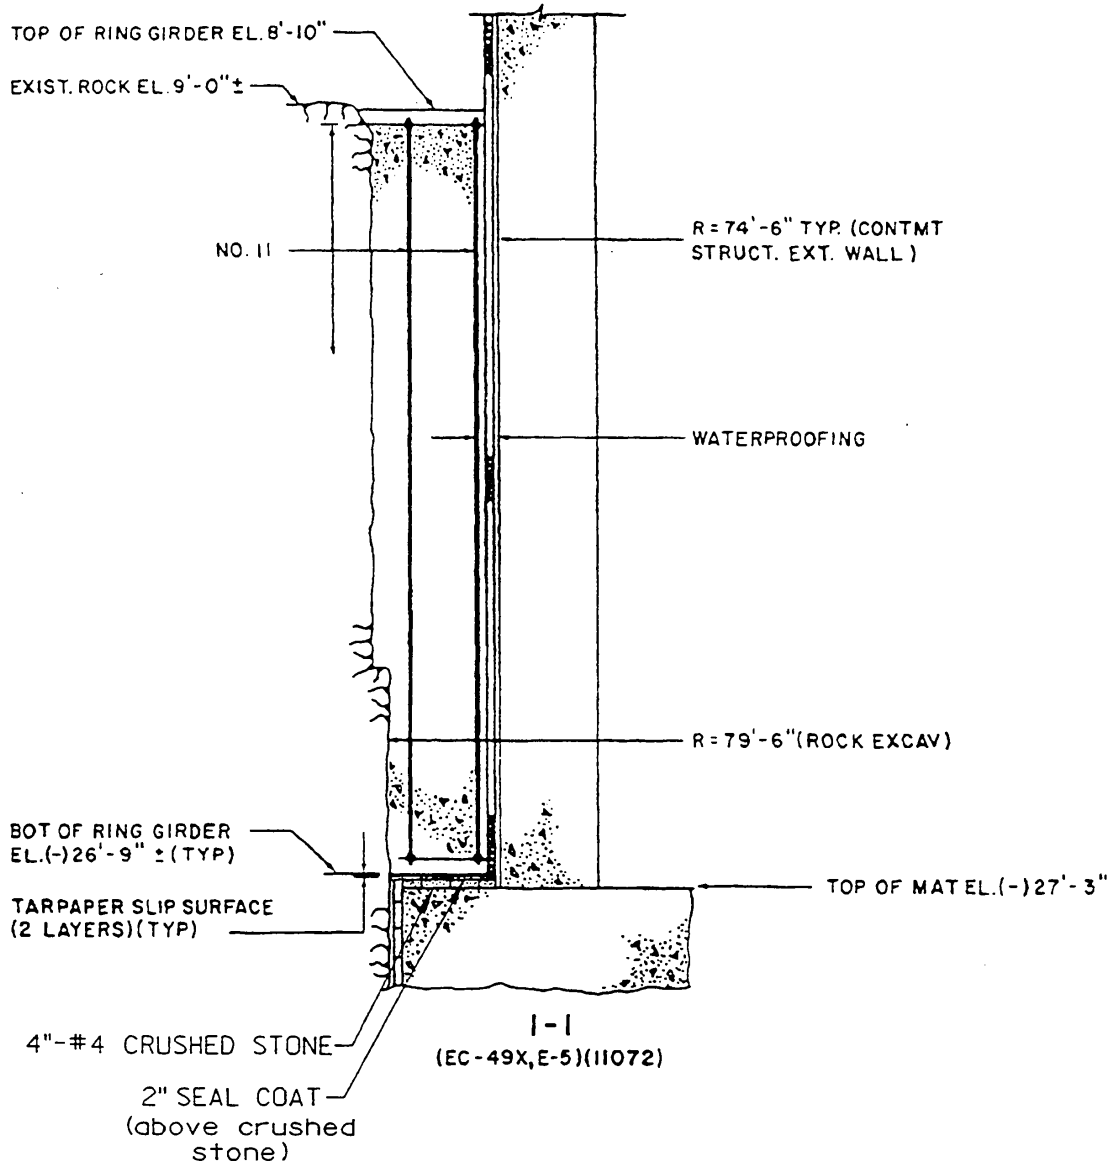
CONTAINMENT STRUCTURE FOUNDATION DETAIL WITH RING GIRDER (SHEET 2 OF 2)
